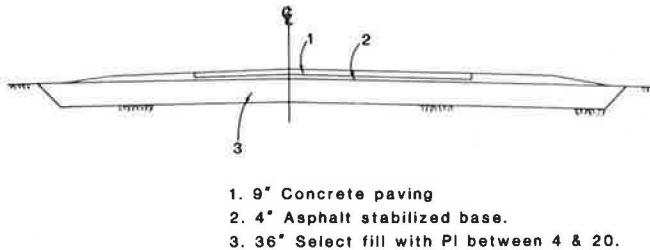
Design section, Site 2, Westbound I-635 at MacArthur Blvd.
